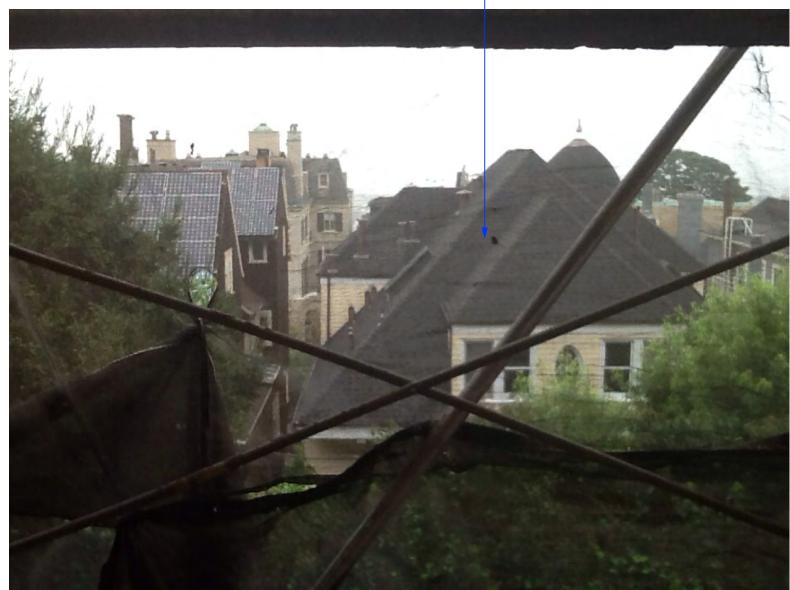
PHOTO LOOKING NORTH FROM SCAFFOLDING (SIMILAR TO BALCONY)
